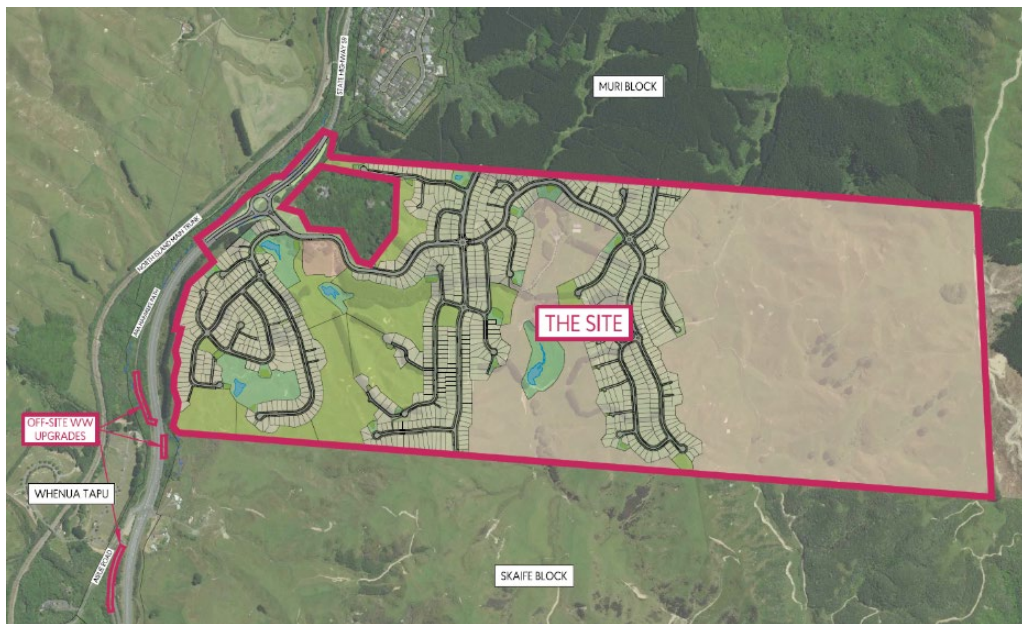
Proposed Site Layout (provided by Envelope Engineering)
